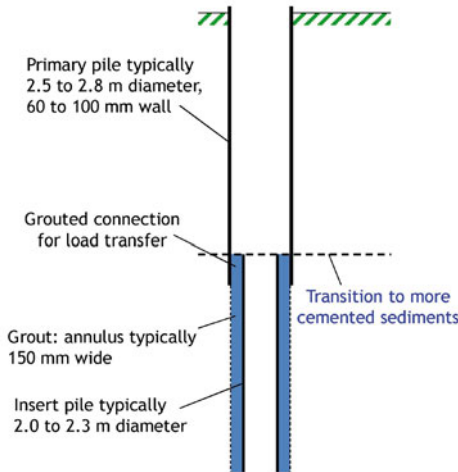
Typical dimensions of a drilled and grouted insert pile.
